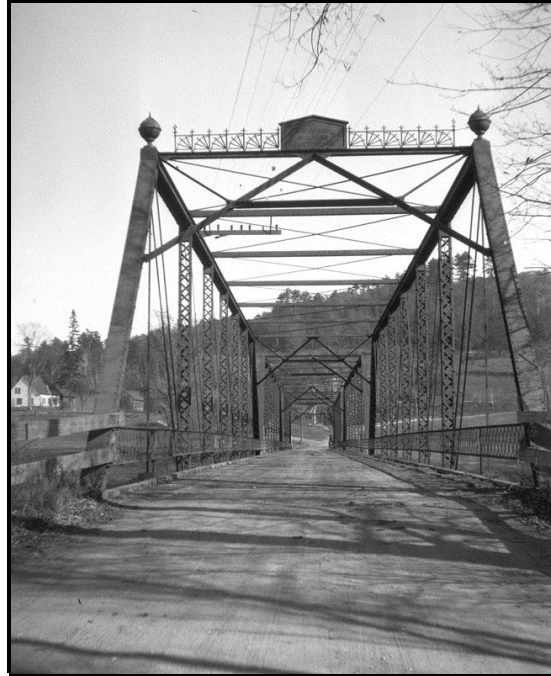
East Thetford Bridge, built 1896 by Canton Bridge Co. Vermont portal and deck view to New Hampshire in 1922 (Storrs 1922).
